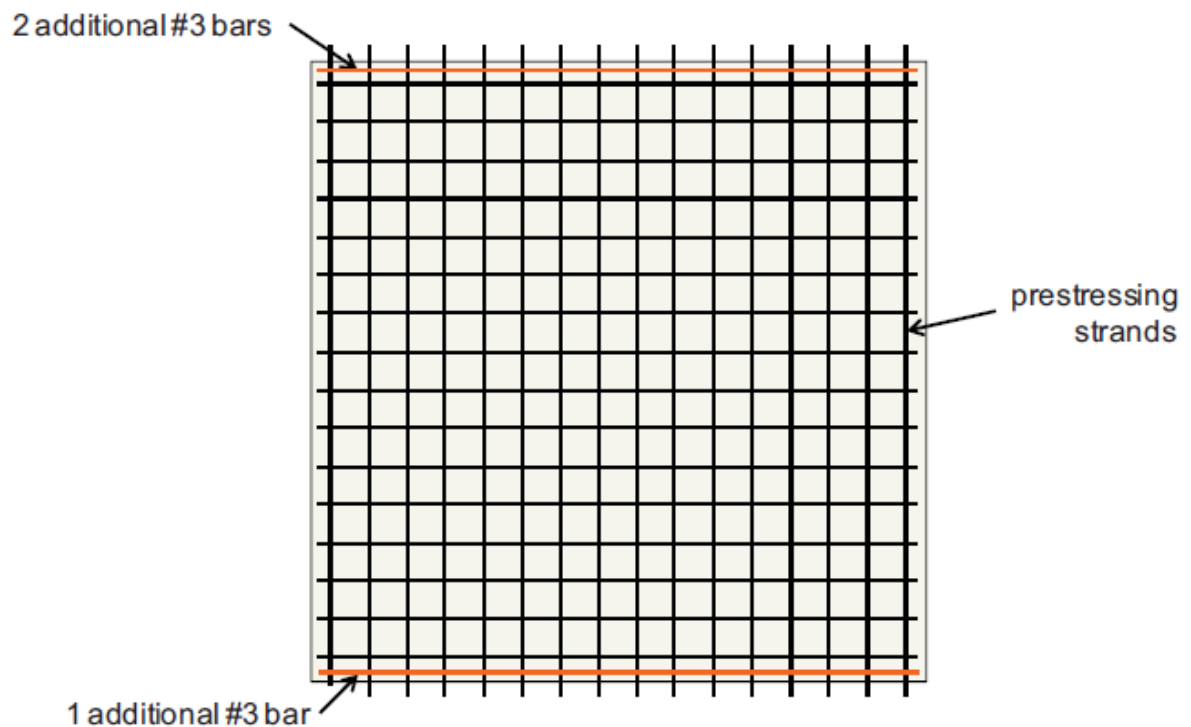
Plan View of Layout of Reinforcement in Panels M3, M4, and M5
